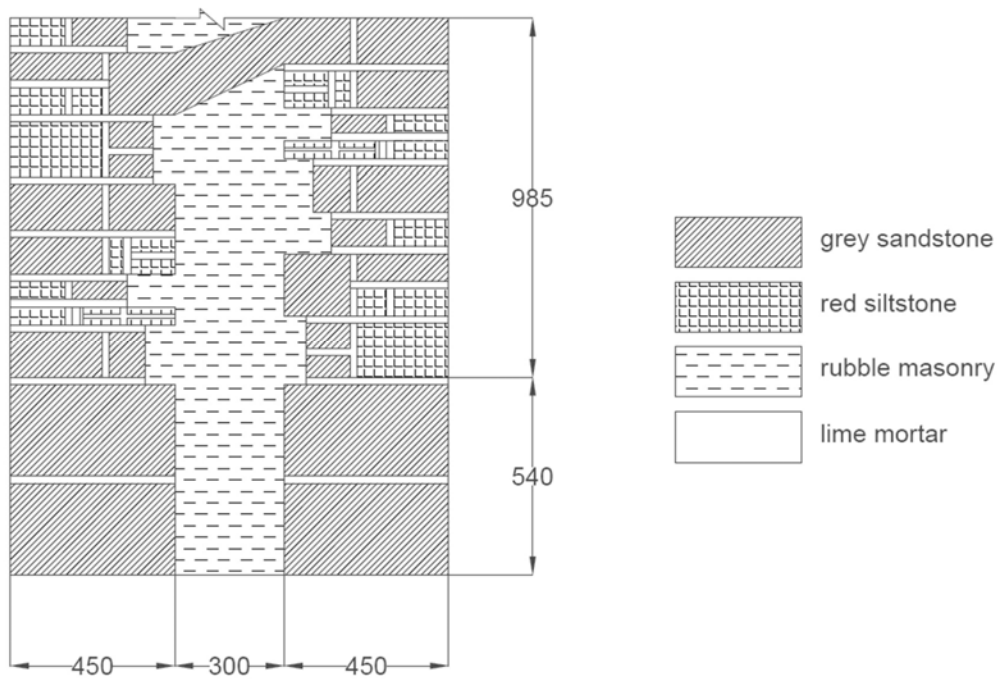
Sectional wall configuration 2 with connecting stones and legend
